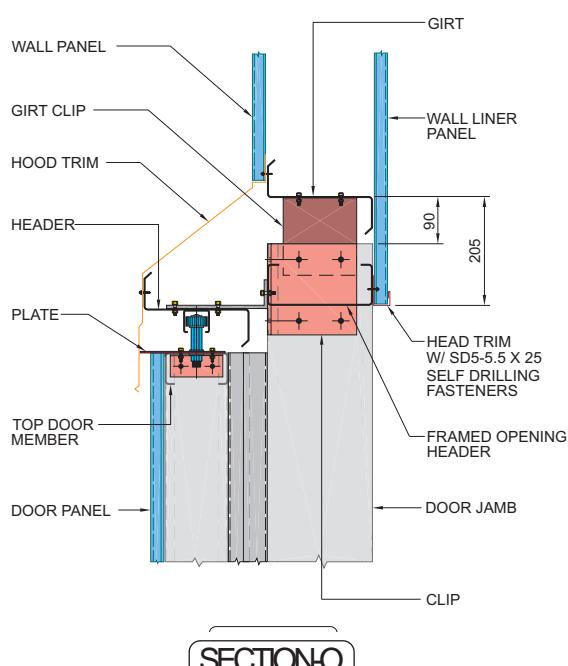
DETAIL : LINER AT WALL WITH ROLL-UP DOOR
